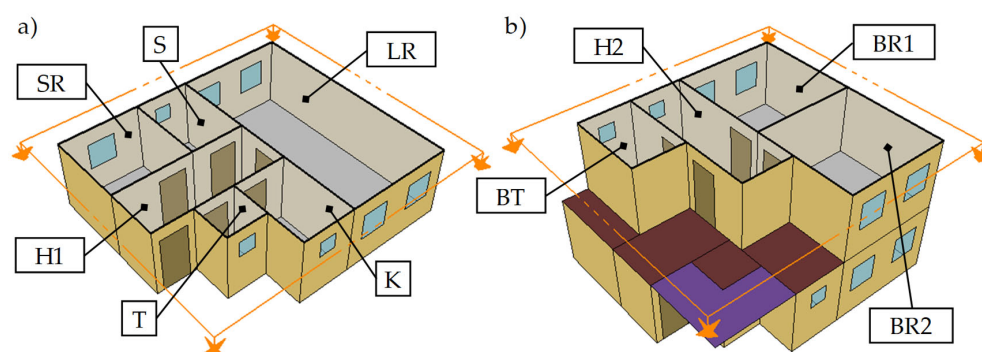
Horizontal cross-section view of the analyzed building and room layouts: (a) first floor and (b) second floor. Legend: BR1—bedroom 1, BR2—bedroom 2, BT—bathroom, H1—hall 1, H2—hall 2, K—kitchen, LR—living room, S—staircase, SR—study room, and T—toilet.
